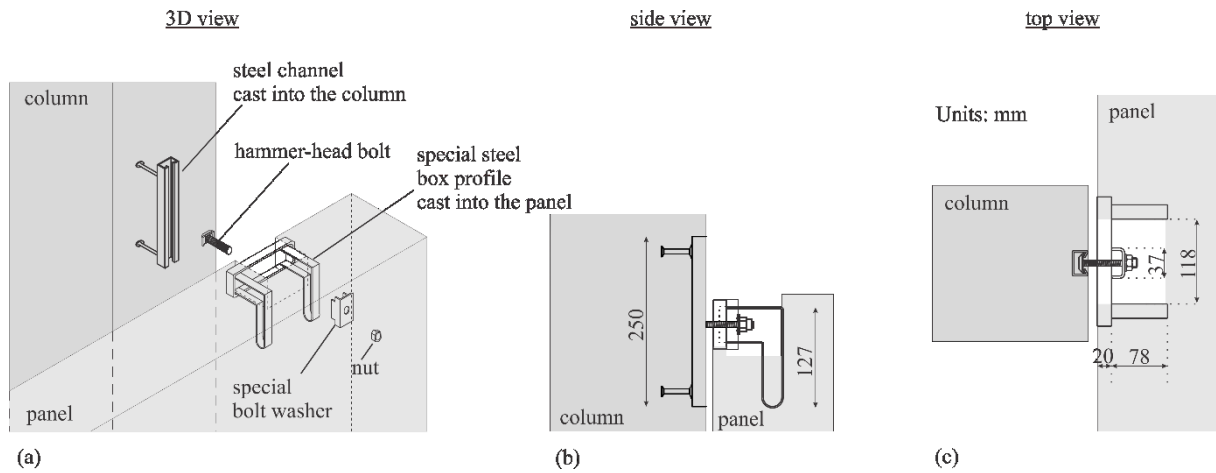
The assembly of the top bolted connection: (a) 3D view, (b) side view and (c) top view
